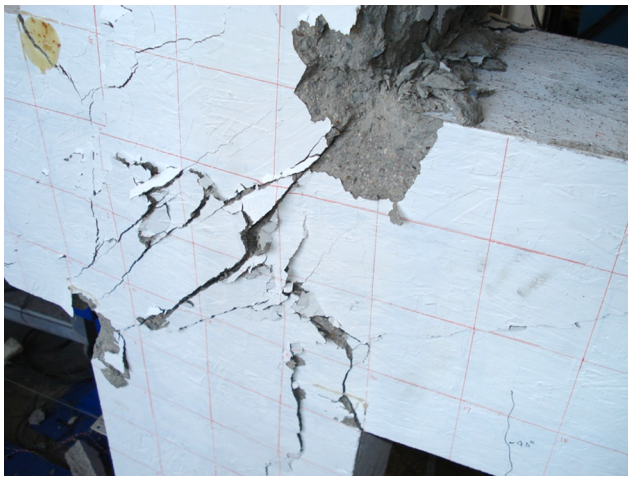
Specimen (AB-1) front view of the joint at ultimate load.
